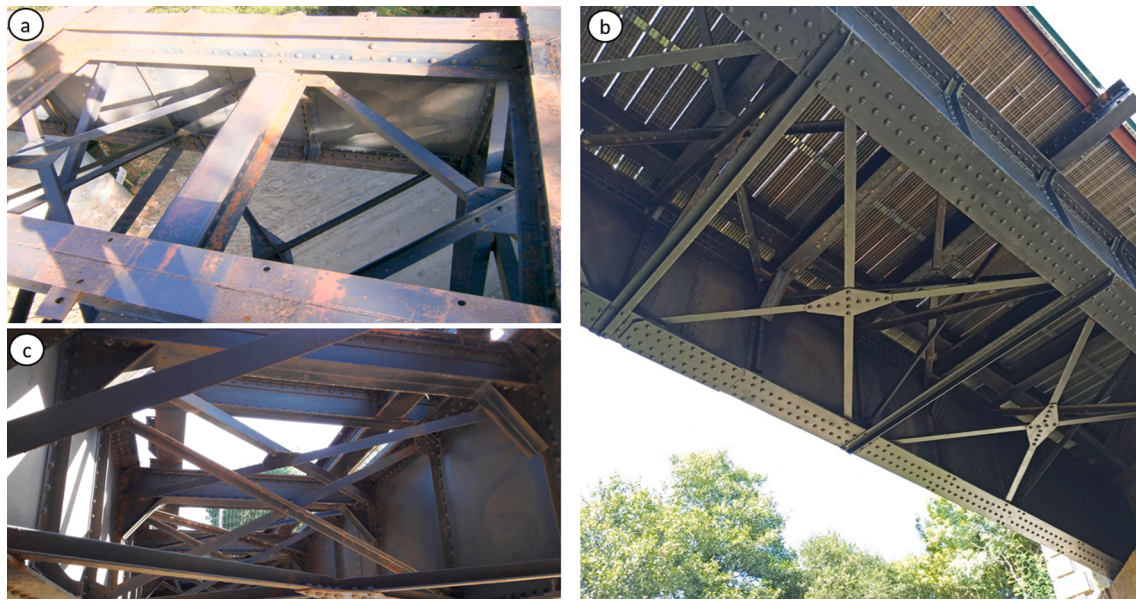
Detail of the bracing systems: a) Upper bracings b) Lower bracings c) Middle bracings.
